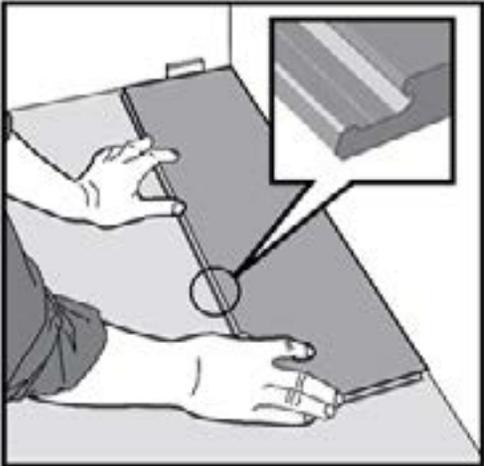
First plank, first row. Place a distance 10 mm thickness to the left and position the plank against the wall. Later, after 3 rows, you can easily position the flooring against the front wall with distances \approx 10 mm.
